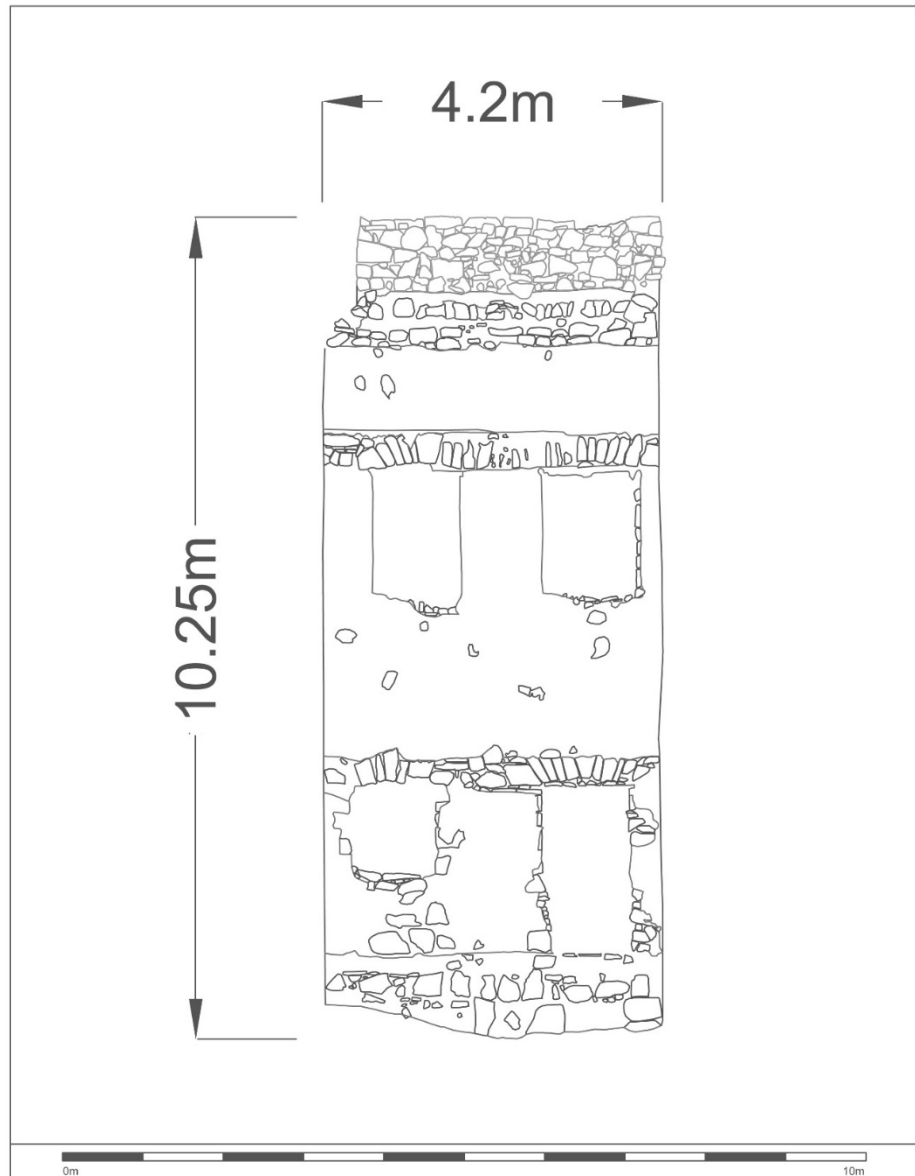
Internal elevation of the south-east wall of the signal tower at Golam Head Signal Station.
